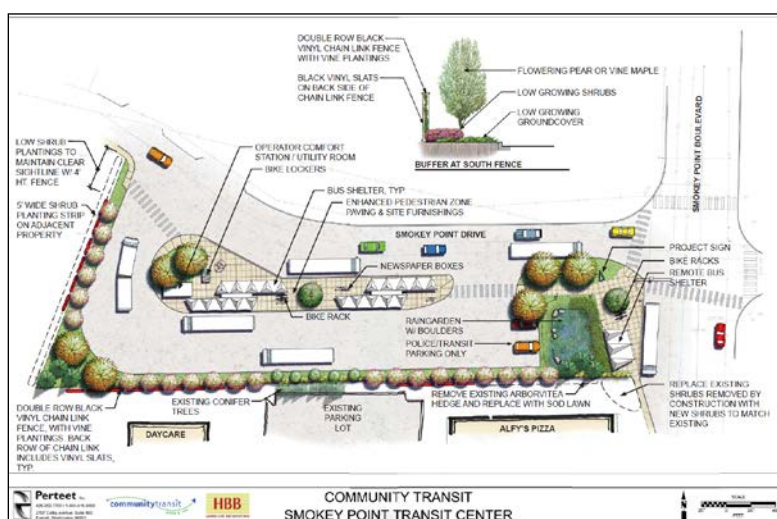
Smokey Point Transit Center - Proposed Site Plan
